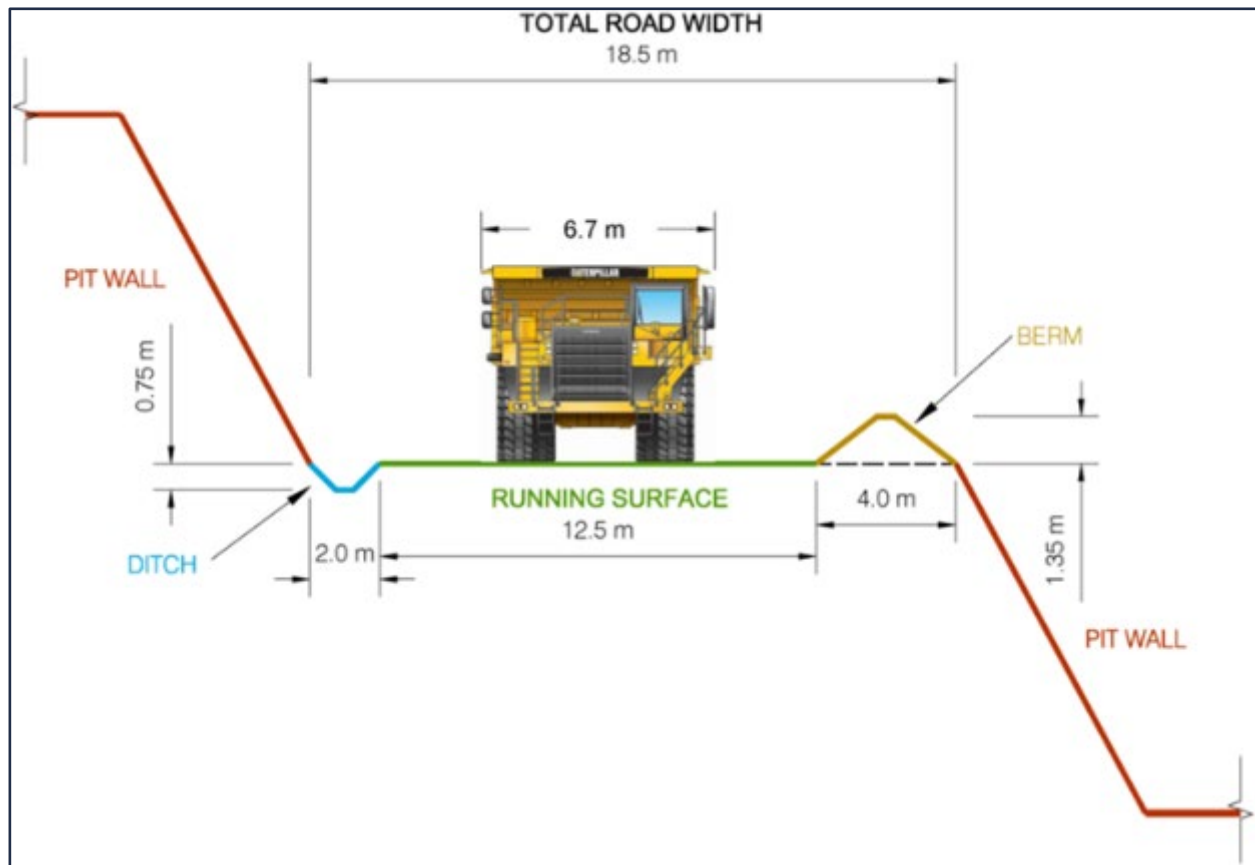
Single-Lane in-Pit Haul Ramp Design
